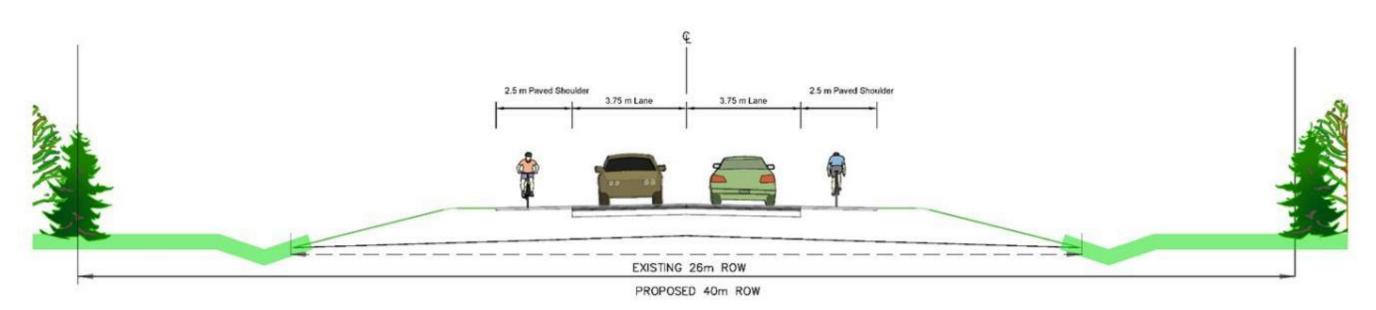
Section 2 Alternative 1 - 2-Lane Rural Cross Section
